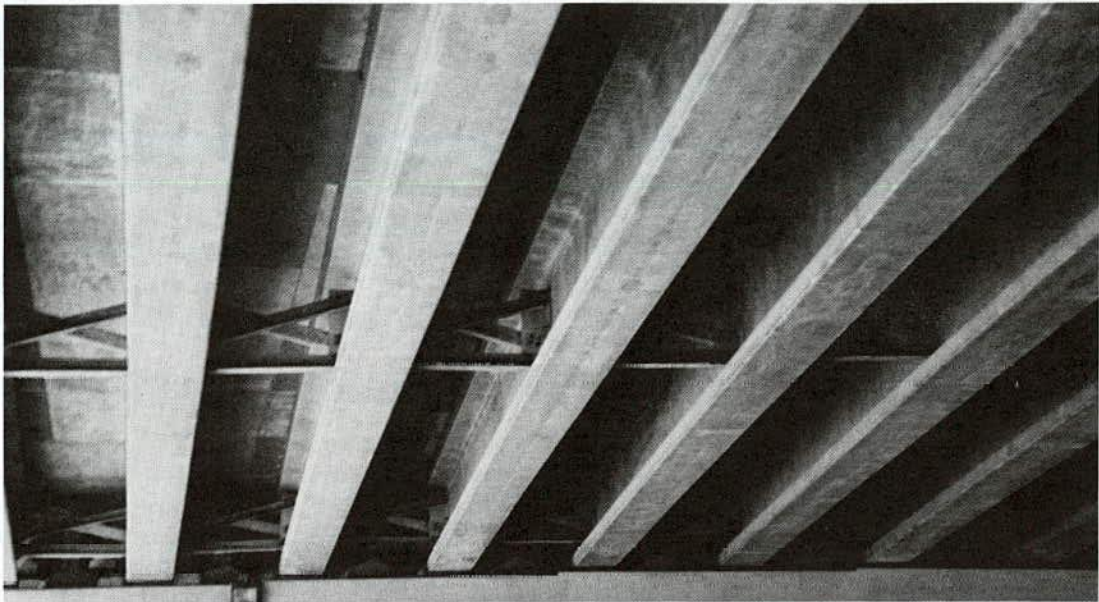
Galvanized steel diaphragms with prestressed beams.
